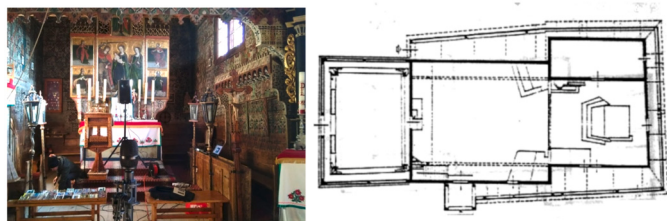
Interior photograph and floor plan of St. Michael Archangel's Church in Dębno.
